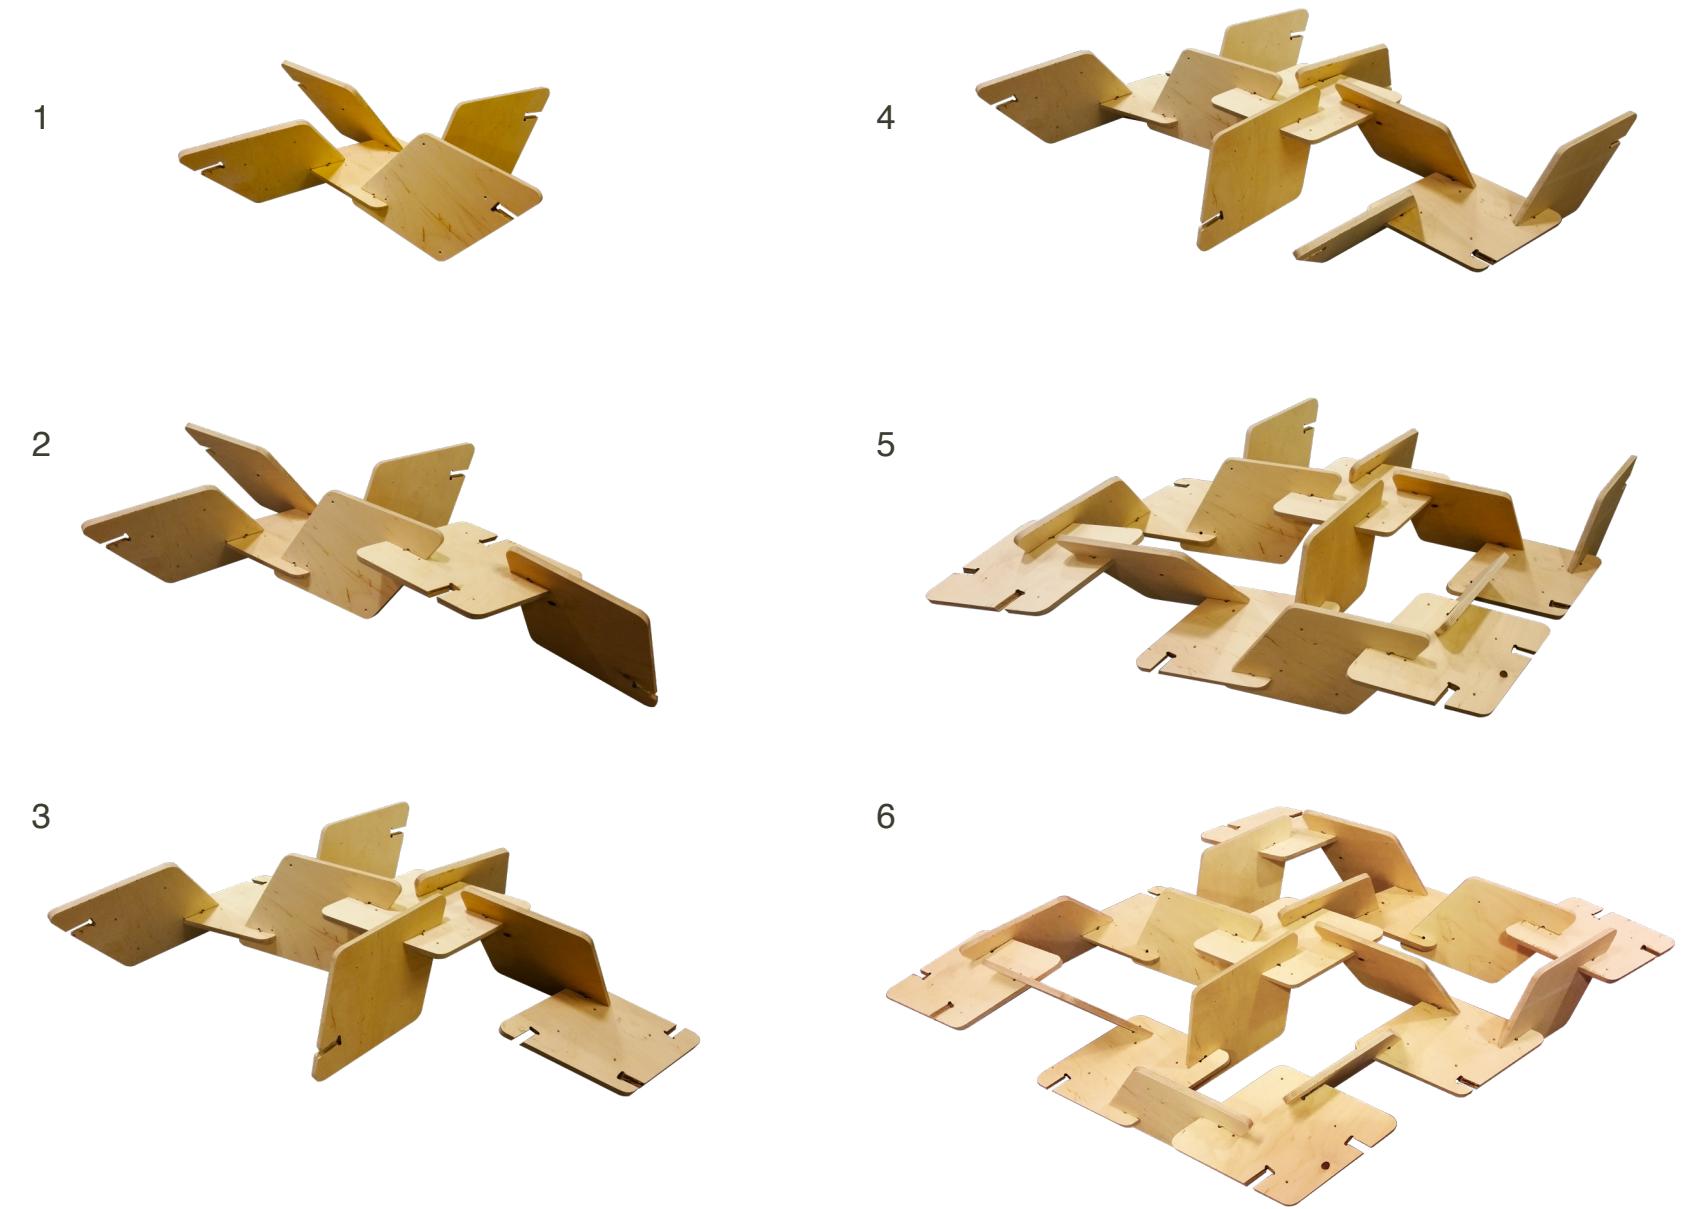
Assembly steps of the 3x3 prototype, rhombic shell
